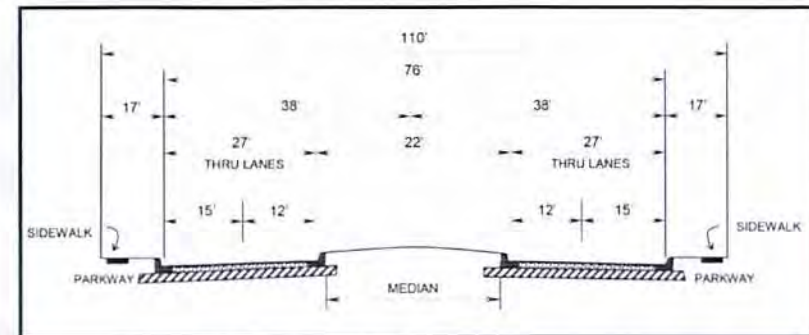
MAJOR ARTERIAL CROSS-SECTION (FOUR LANES DIVIDED)
